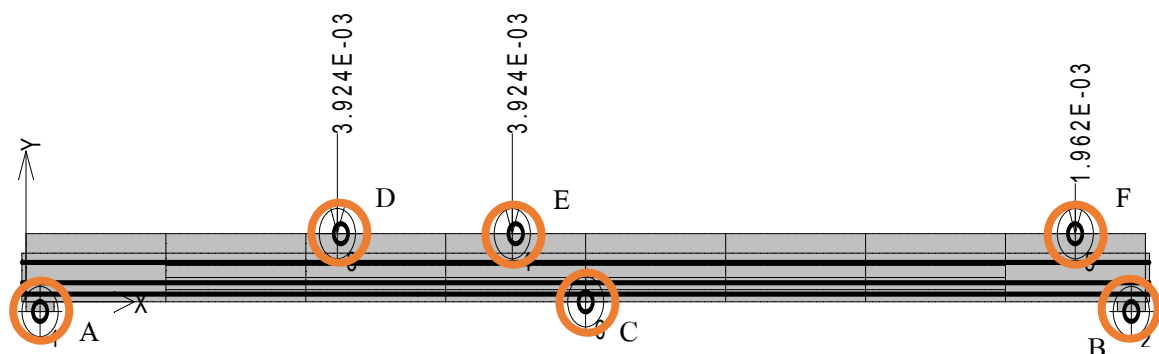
Model of Bridge after add load (MN) and Monitoring point
